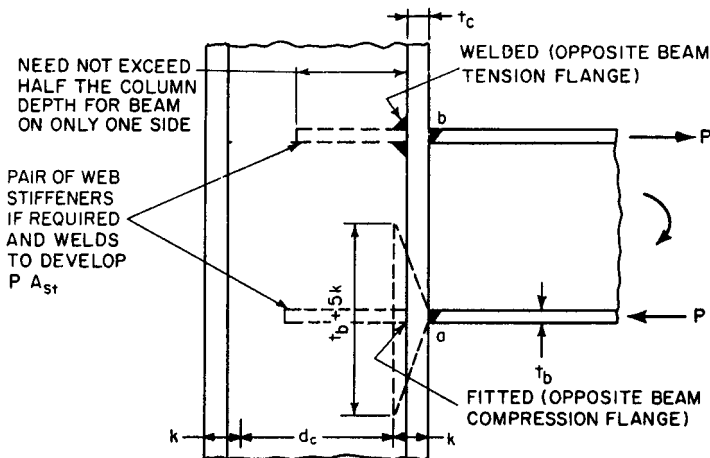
Web crippling in a column at a welded joint with a beam.
